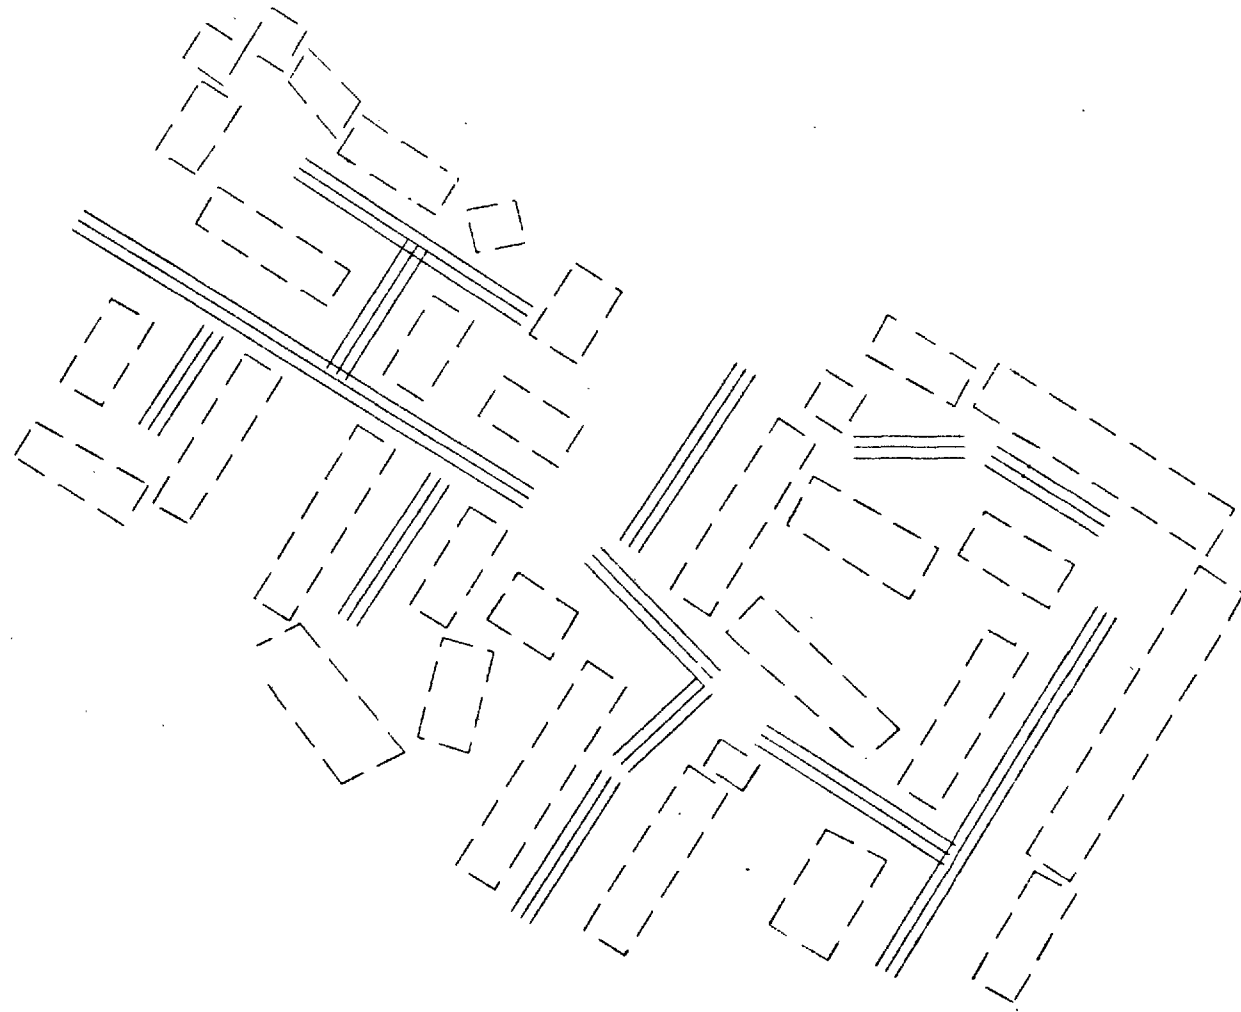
A ROAD AND BUILDING LAYOUT AT THE SKETCH LEVEL OF DESIGN
